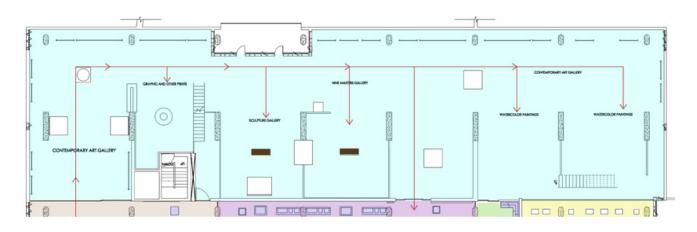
Proposed plan of Contemporary Art Gallery on the First floor
